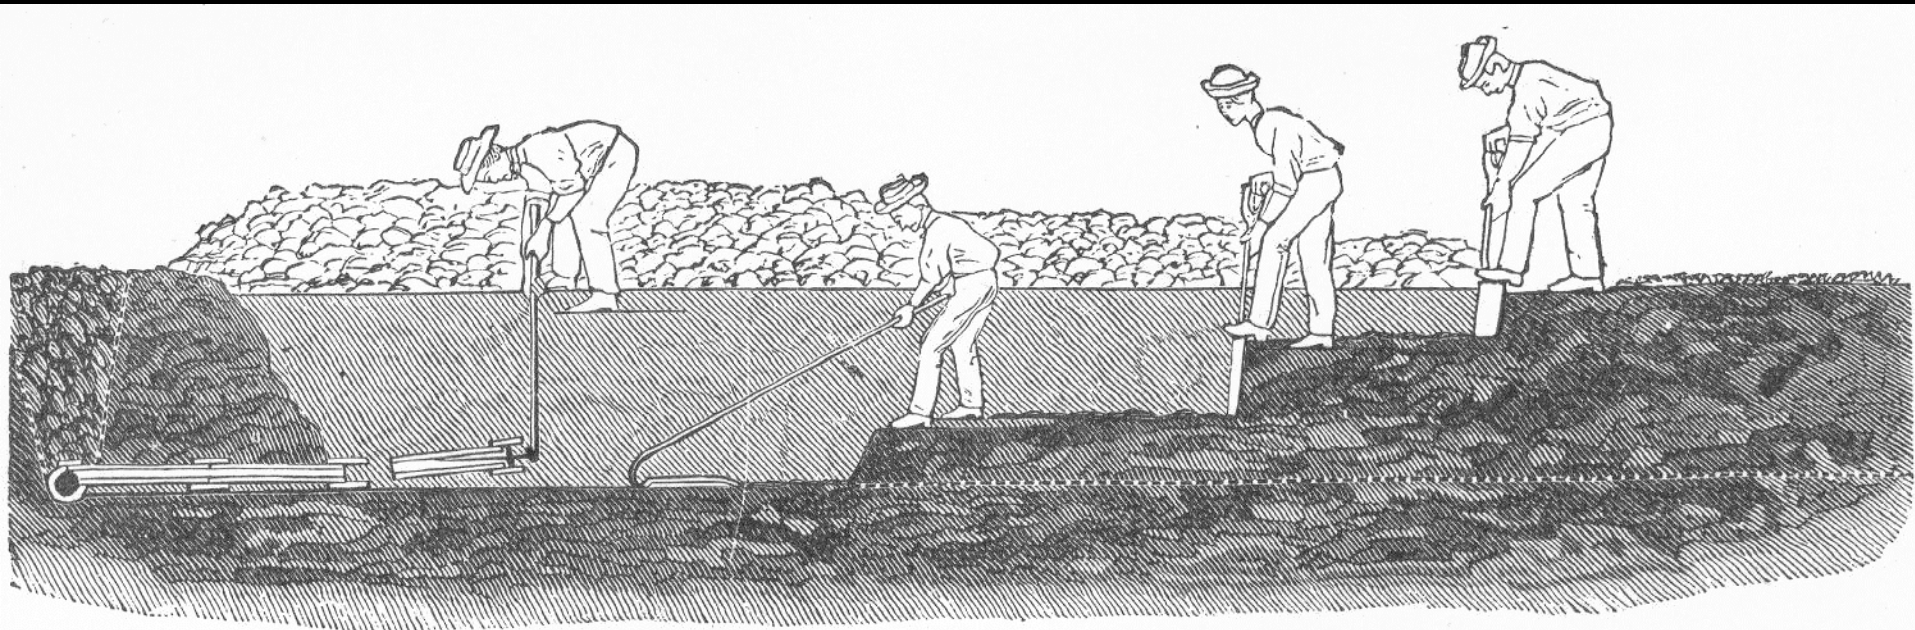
OPENING THE DITCH AND LAYING THE TILES.
